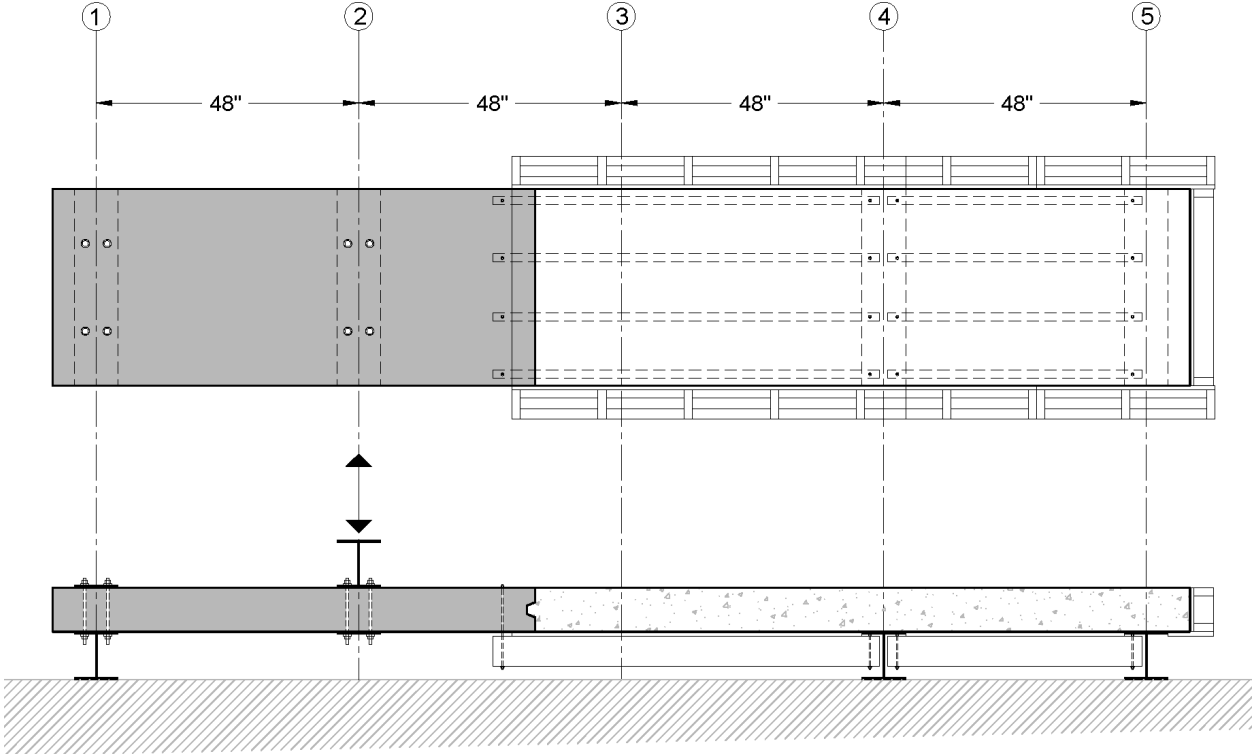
Plan and profile view of formwork system supporting the Stage 2 segment.
